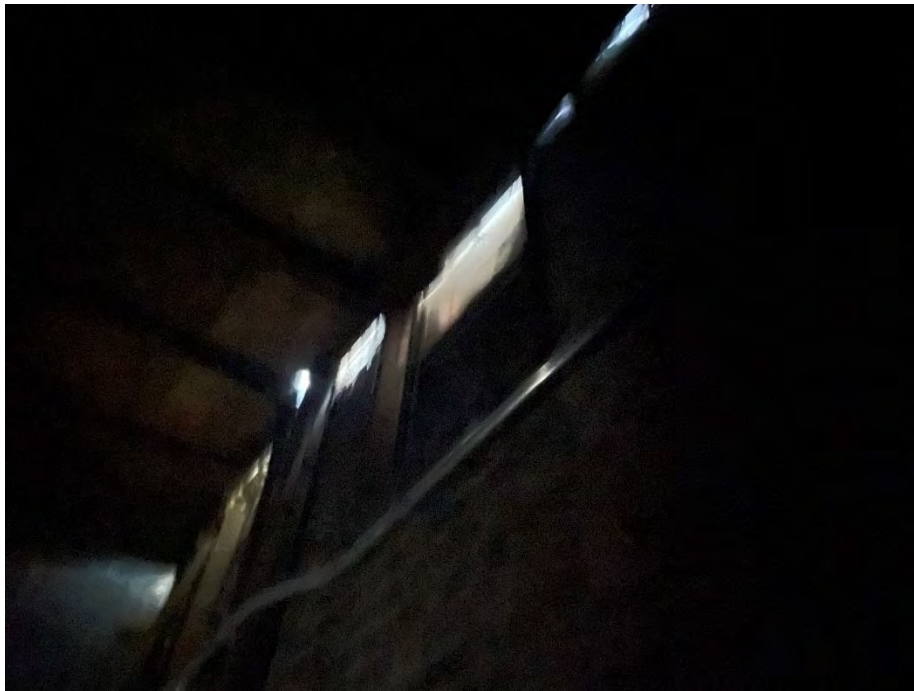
West addition from inside. Daylight is showing in the roof. Area needs to be repaired or torn down. If torn down, then a drain needs to be added at the base of the stairs to capture rain water.
